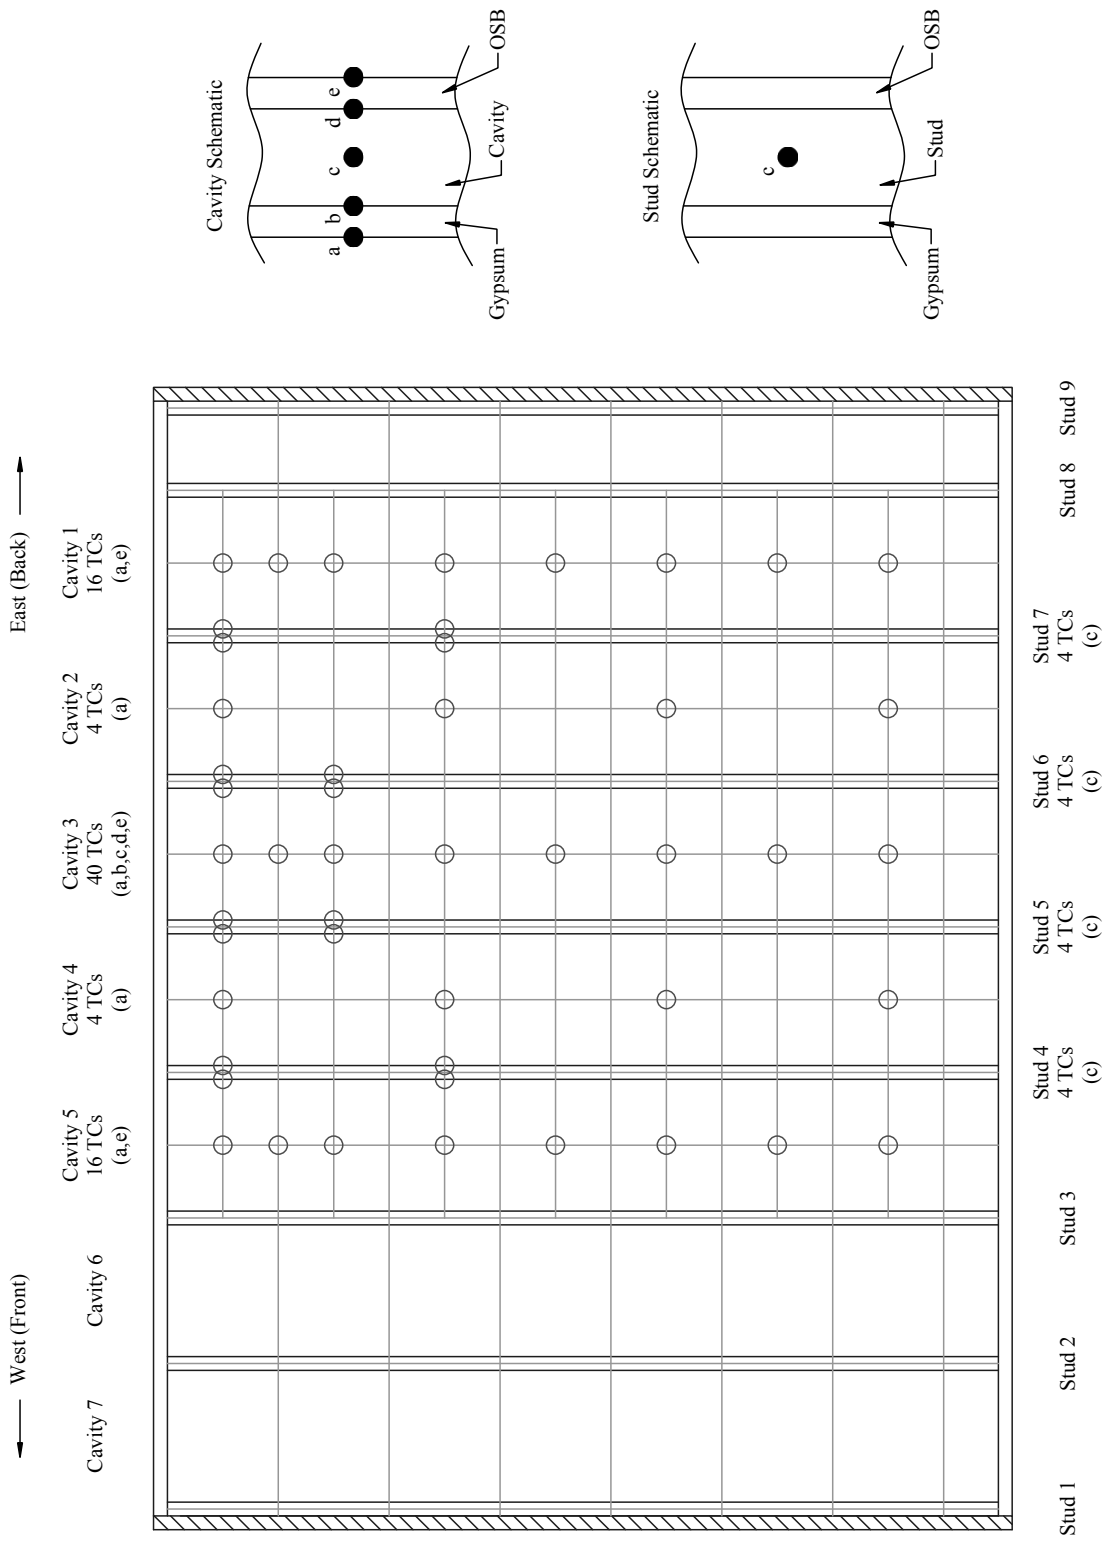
Overall thermocouple instrumentation plan for the test wall.
